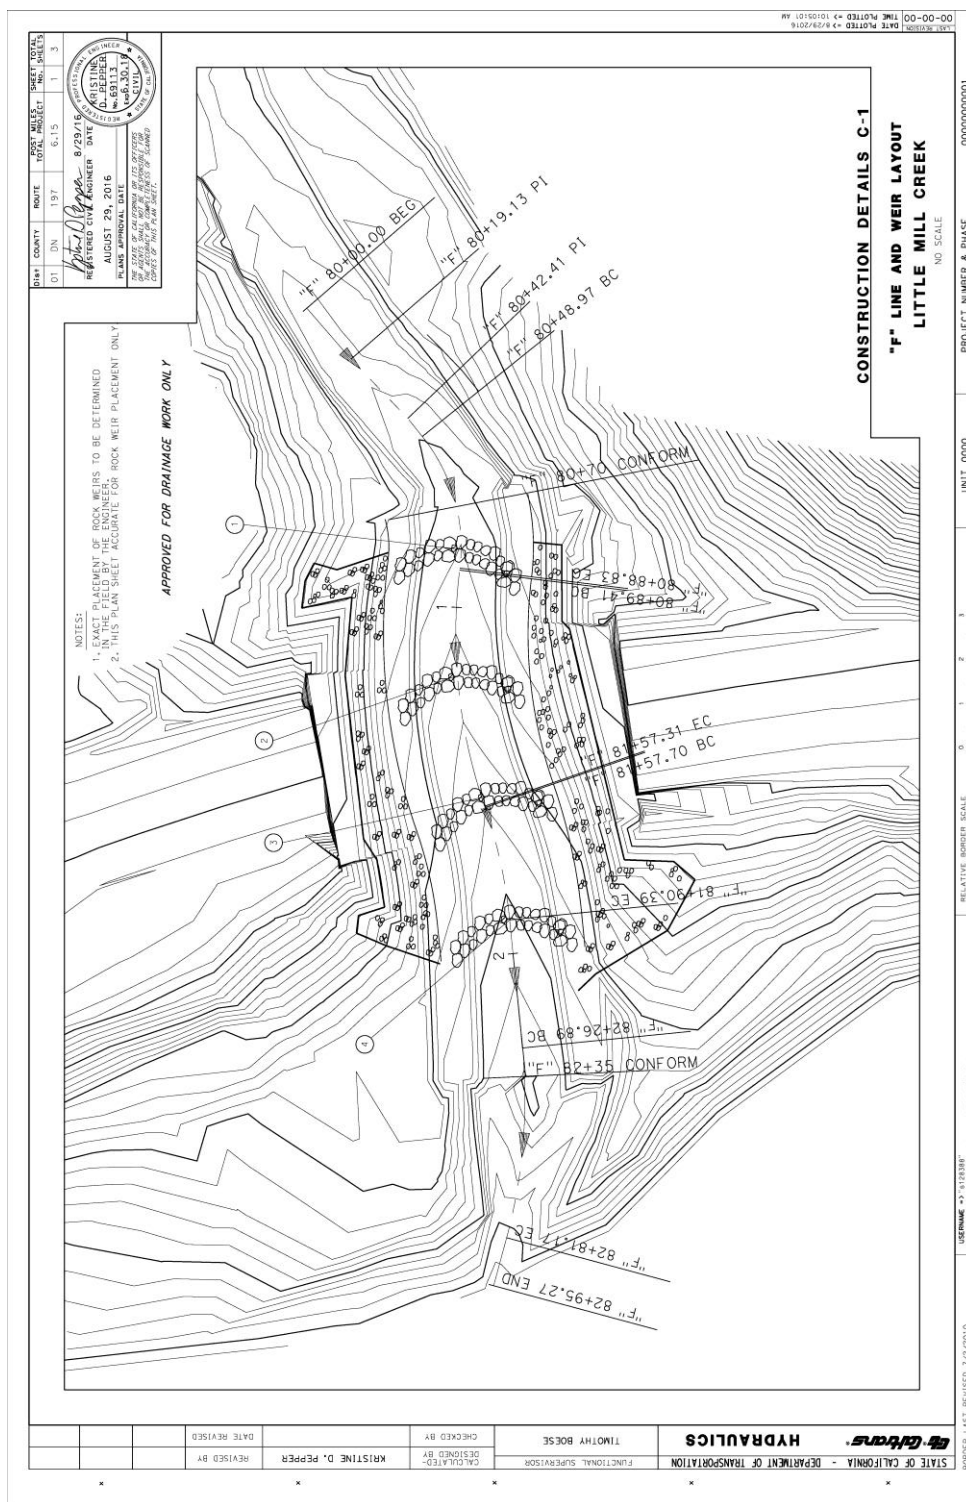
Caltrans design drawing of Little Mill Creek channel layout. Stations identified along flowline. See the first page (C-1) in Attachment 1 for full-size drawing.
